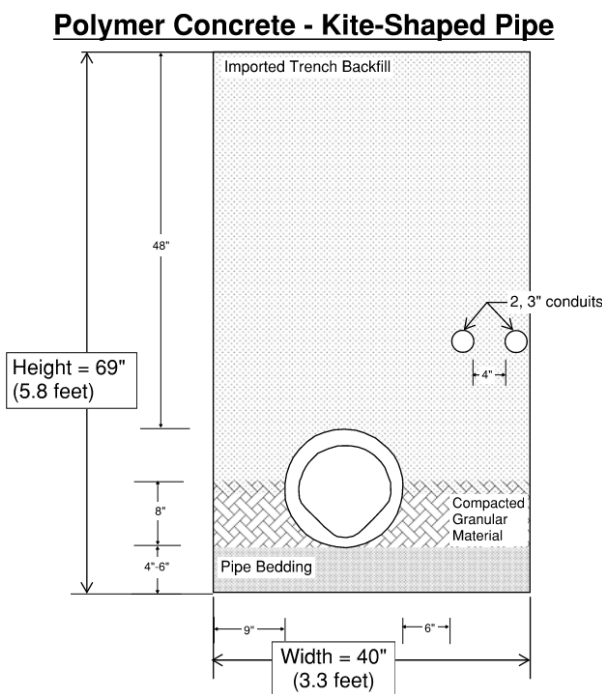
Polymer Concrete - Kite-Shaped Pipe Trench Section
